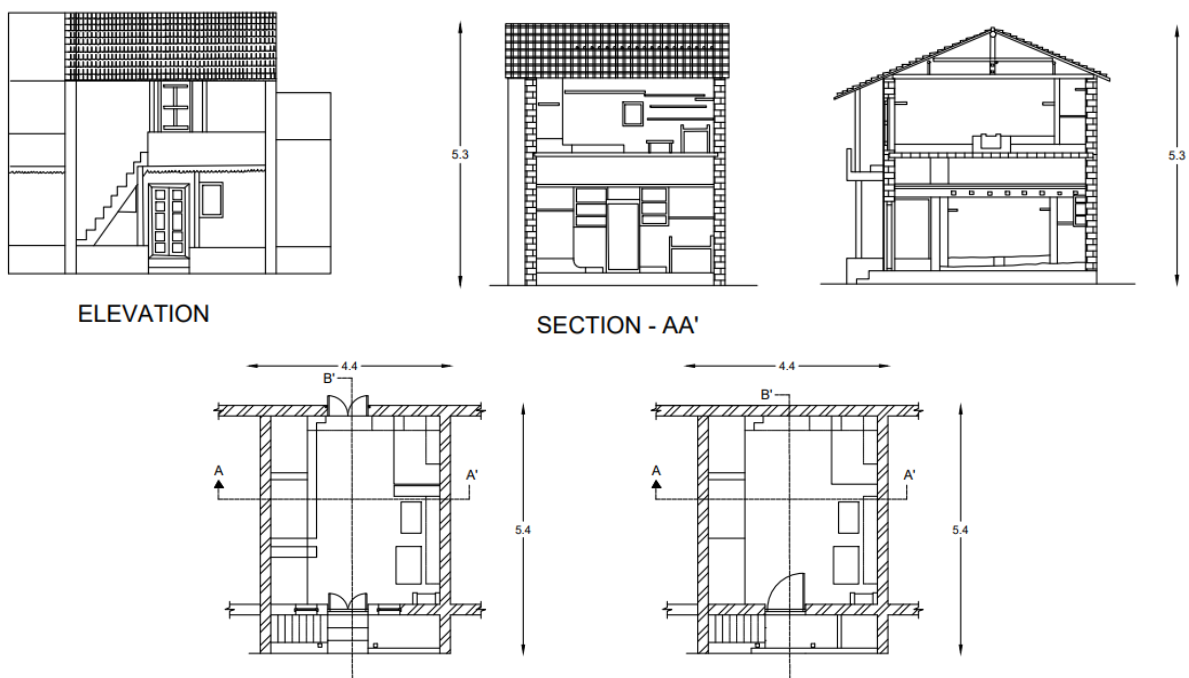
Floor Plan, Section and elevation of Brick house of Poombharai
